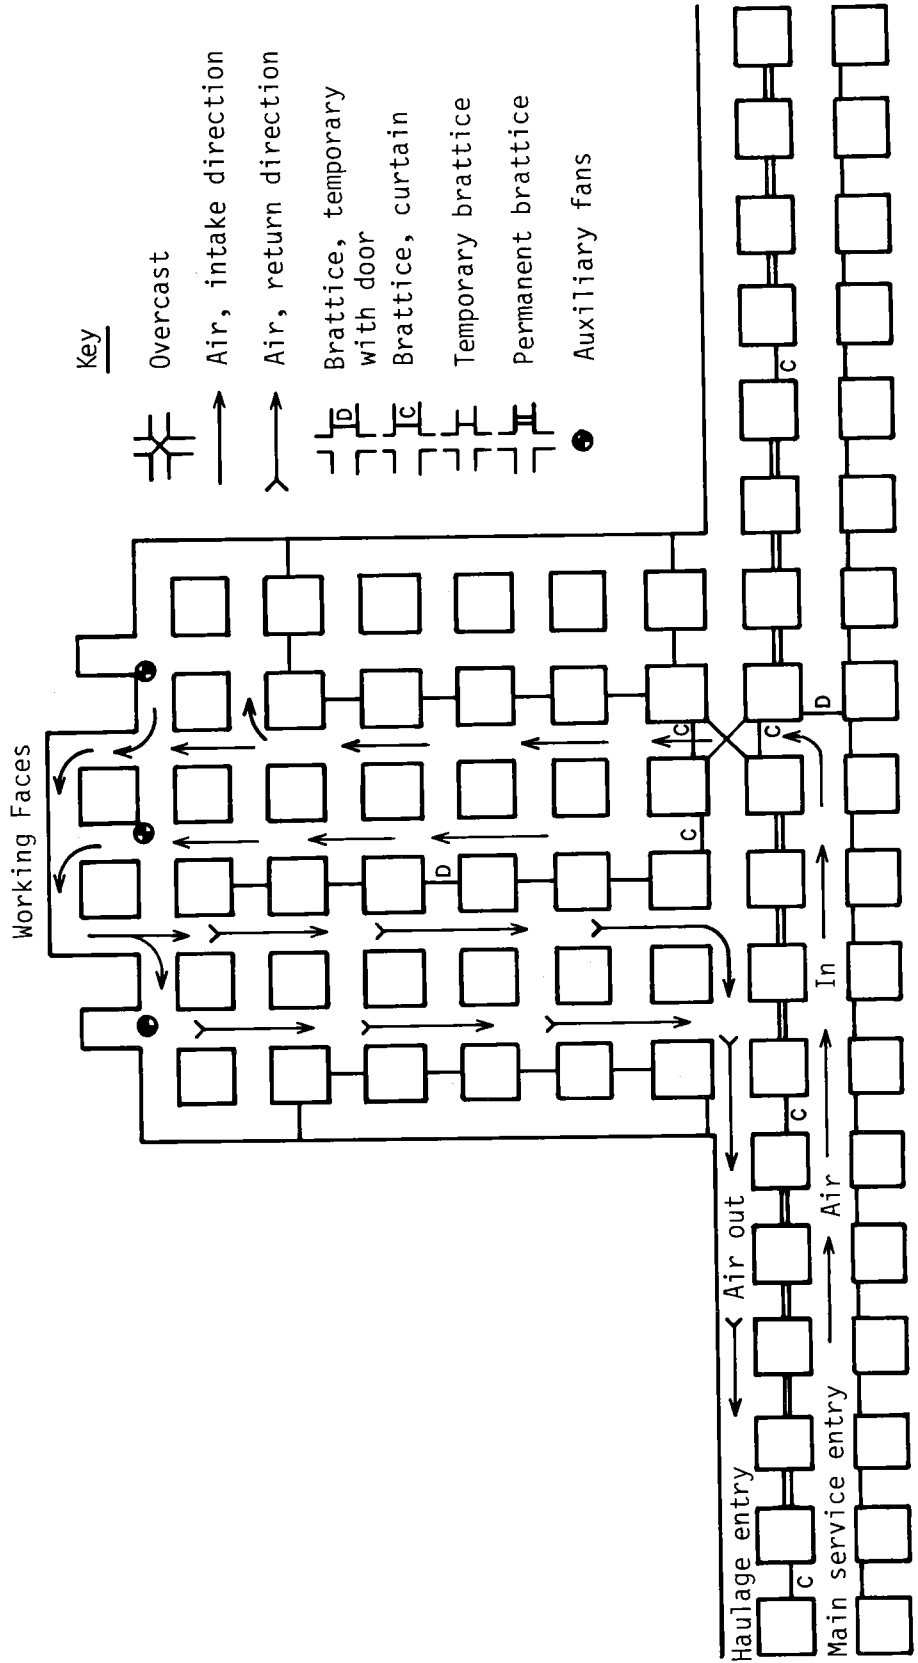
Generalized plan of room-and-pillar mining system showing typical ventilation flow.
